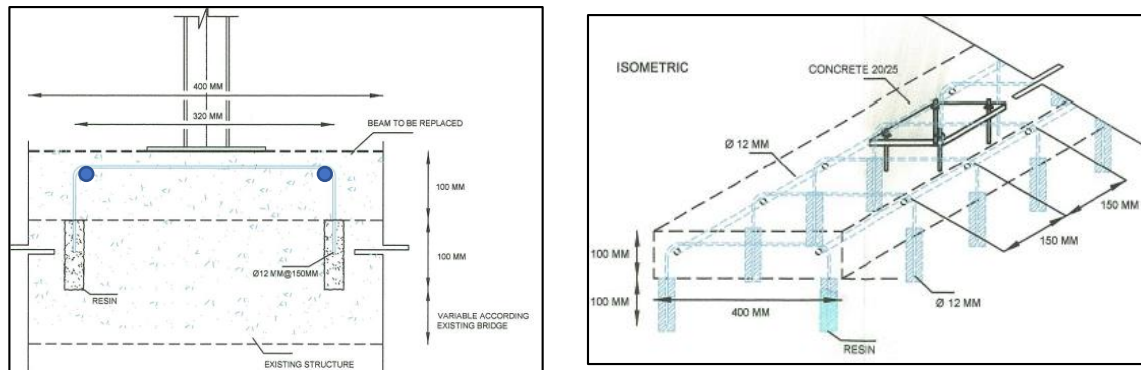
Upgrading of beam for fence: arrangement of reinforcing bars and the way of fixing Π bars in “old” concrete
